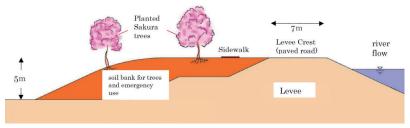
Cross-section of the tree-planted soil bank on the levee slope 図 4 堤防のり面での植樹盛土横断図
